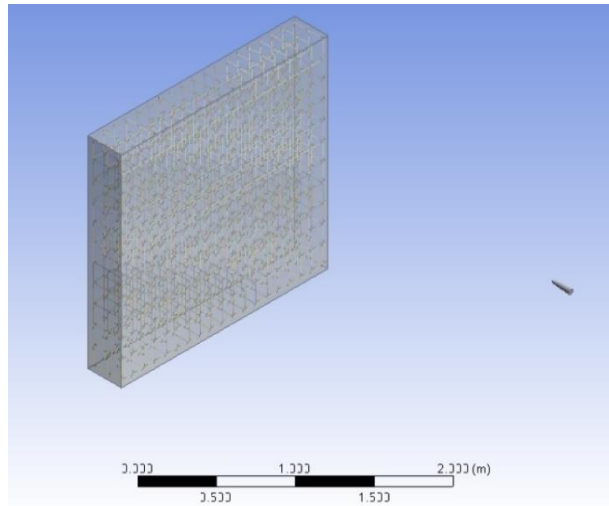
Reinforced Concrete Wall with Fragment due to 16.30 kg TNT Shaped Charge.
